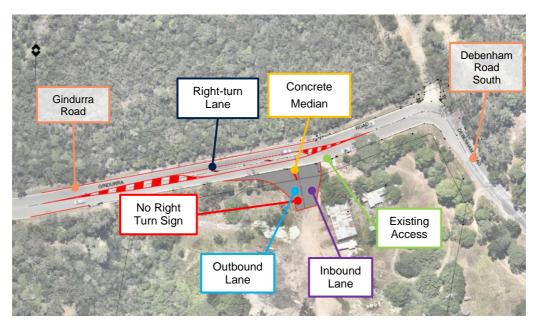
| Proposed Site Access and Right Turn Treatment on Gindurra Road
